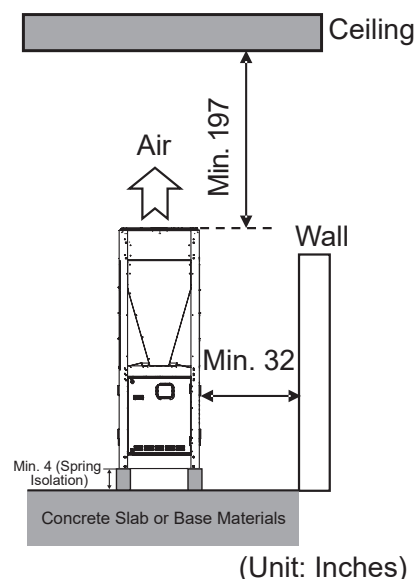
Ventilation Clearance Requirements When Installing the Chiller Along One Wall.
